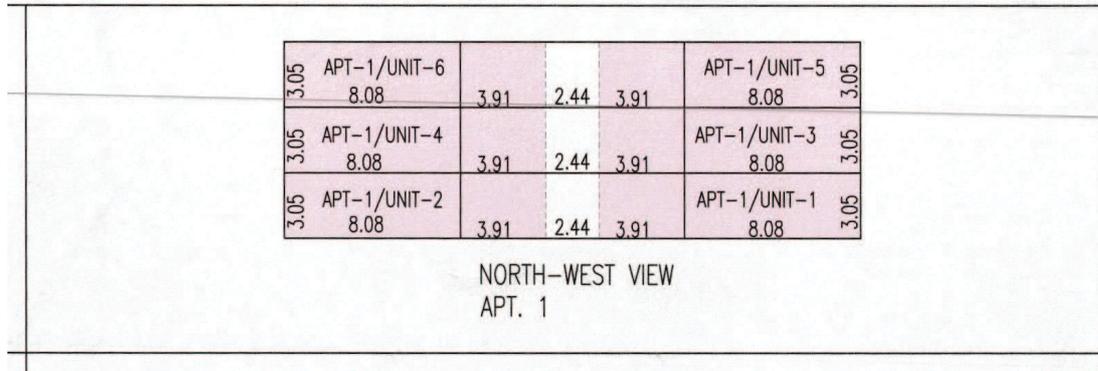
View of a detail of a cadastral plan showing a vertical section of a condominium
